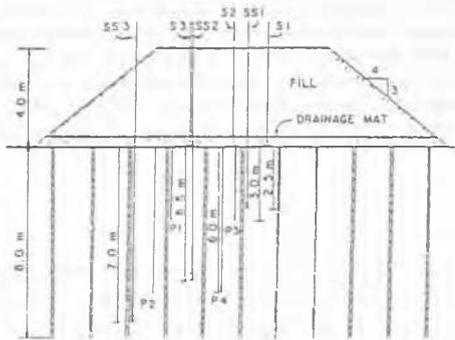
Cross section of test embankment on vertical drains (EVD)
